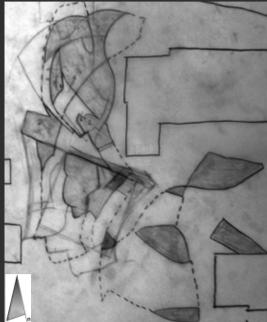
conceptual exploration of ground floor plans and site layout for both new proposed buildings.
